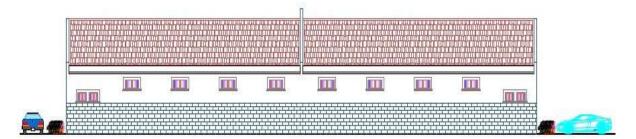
Proposed back elevation of a lock-up shop building with the arrangement of high level mini windows and the normal toilet windows below their heights.
